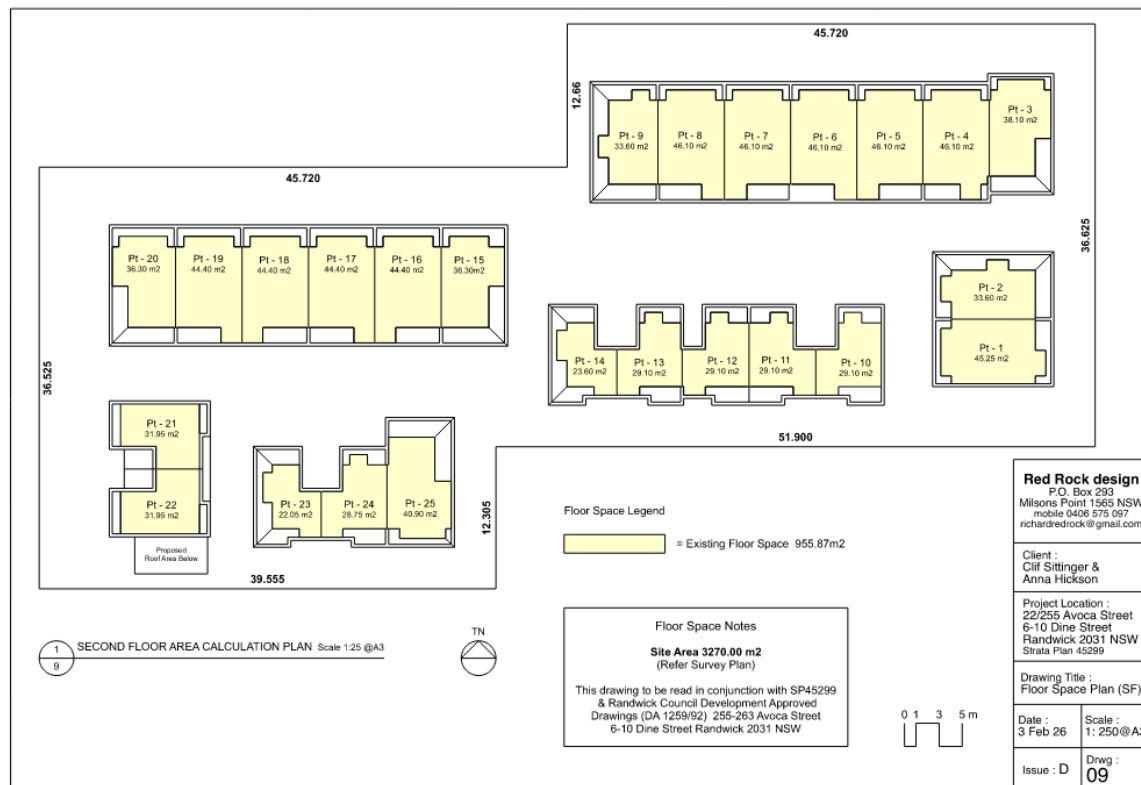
Second floor Calculation Plan (Source: Red Rock Design).
